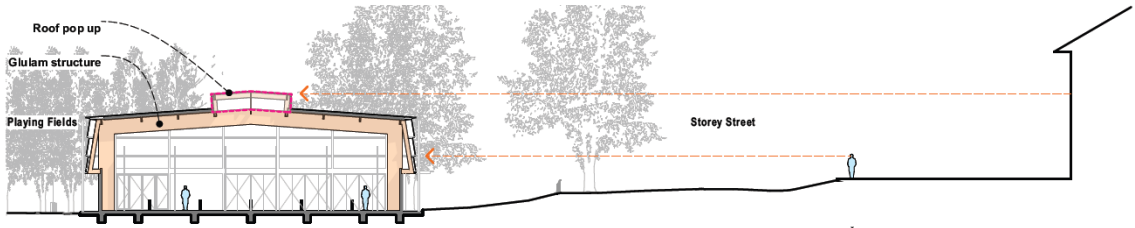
Relationship of the Indoor Training Facility to Storey Street. The building is nestled into the park and its landscaped setting to minimise its impact on Storey Street residences.
